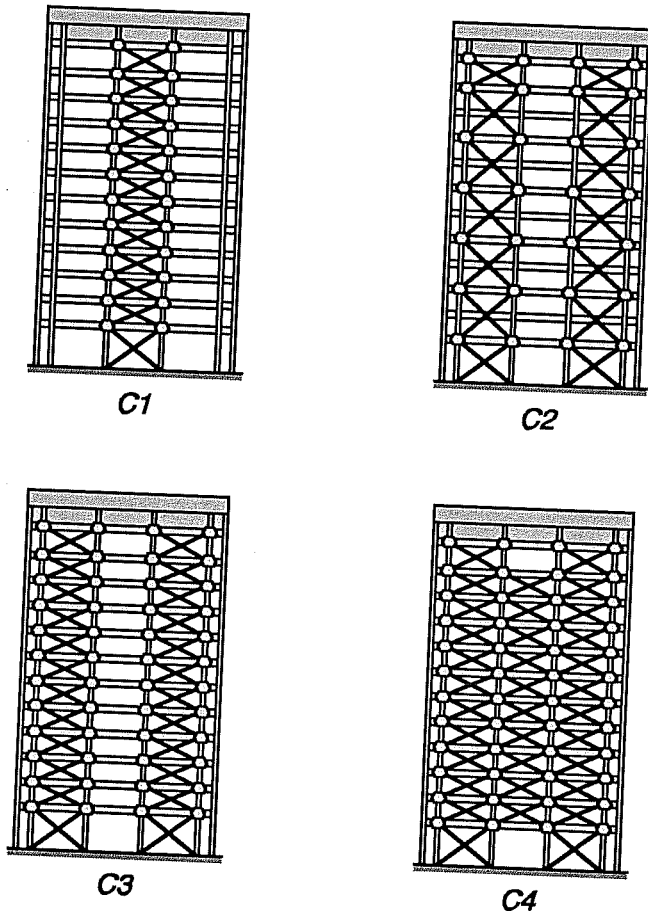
Bracing configurations for the twelve-story building with post-tensioned bracing system. (perimeter frames only)
